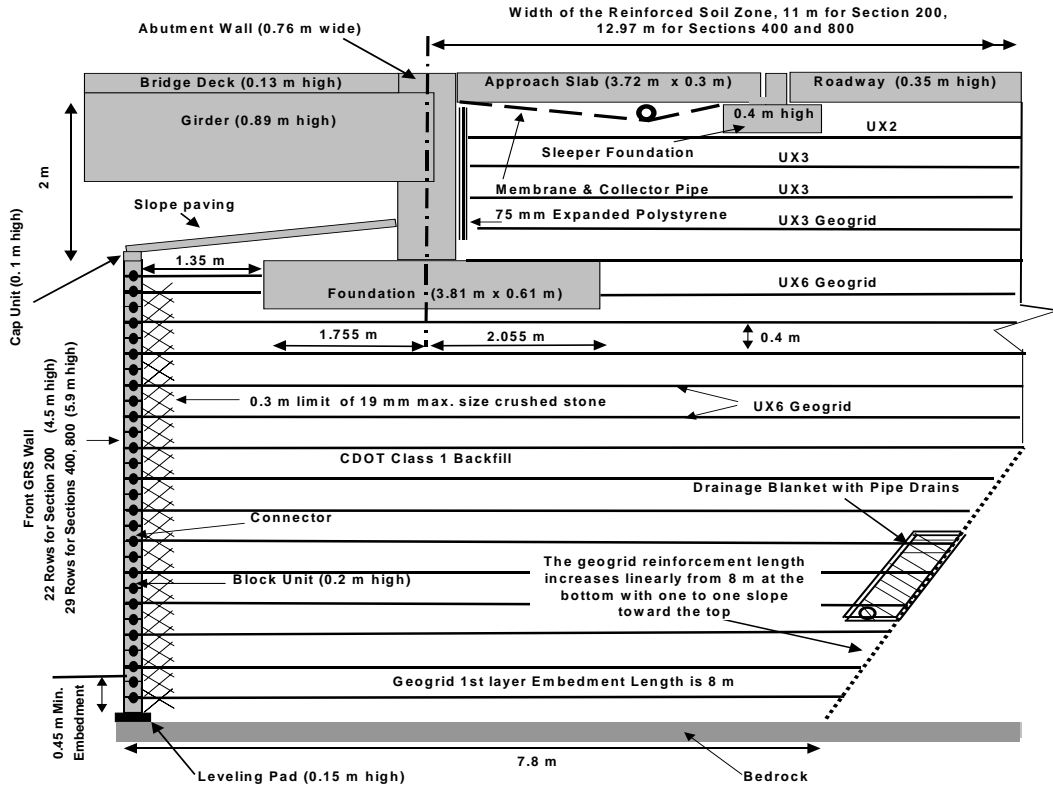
Typical Section through Front and Abutment GRS Walls of the Founders/Meadows Bridge Structure.
